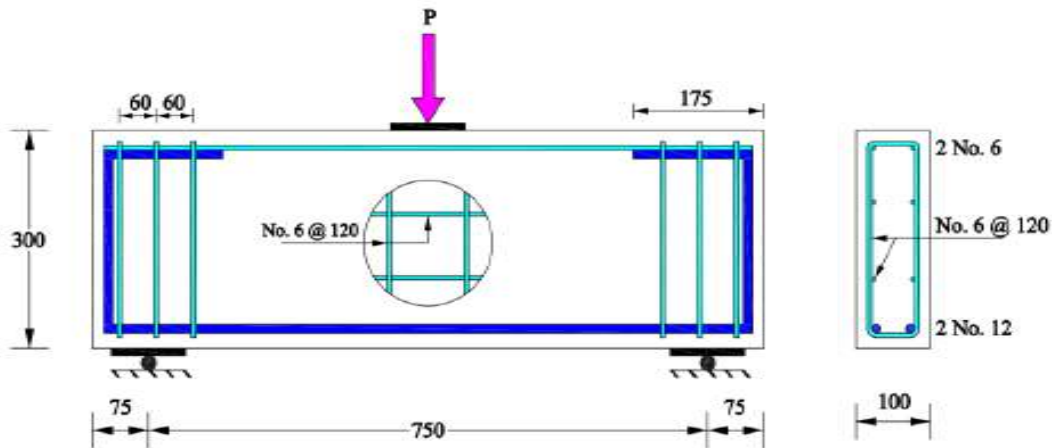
Details of test specimen (units in mm). Hussain, Q., & Pimanmas, A., [47]
